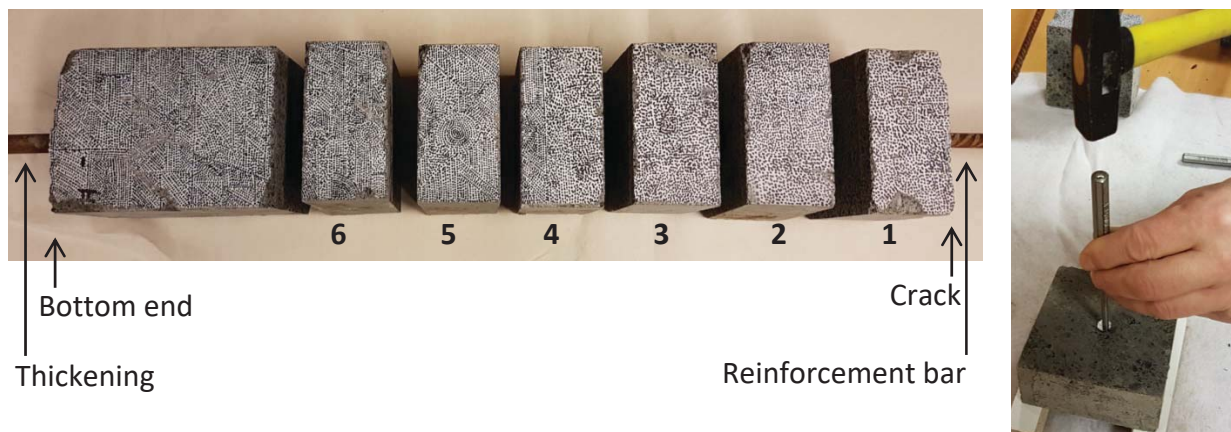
The bottom part of concrete strand 2 (see Fig. 8) was cut into seven pieces for comparison of the bond between the reinforcement and the concrete. The reinforcement in the two concrete pieces closest to crack were loose inside the concrete, but the resistance in the bar increased with the distance away from the crack. The resistance was checked with a hammer.
